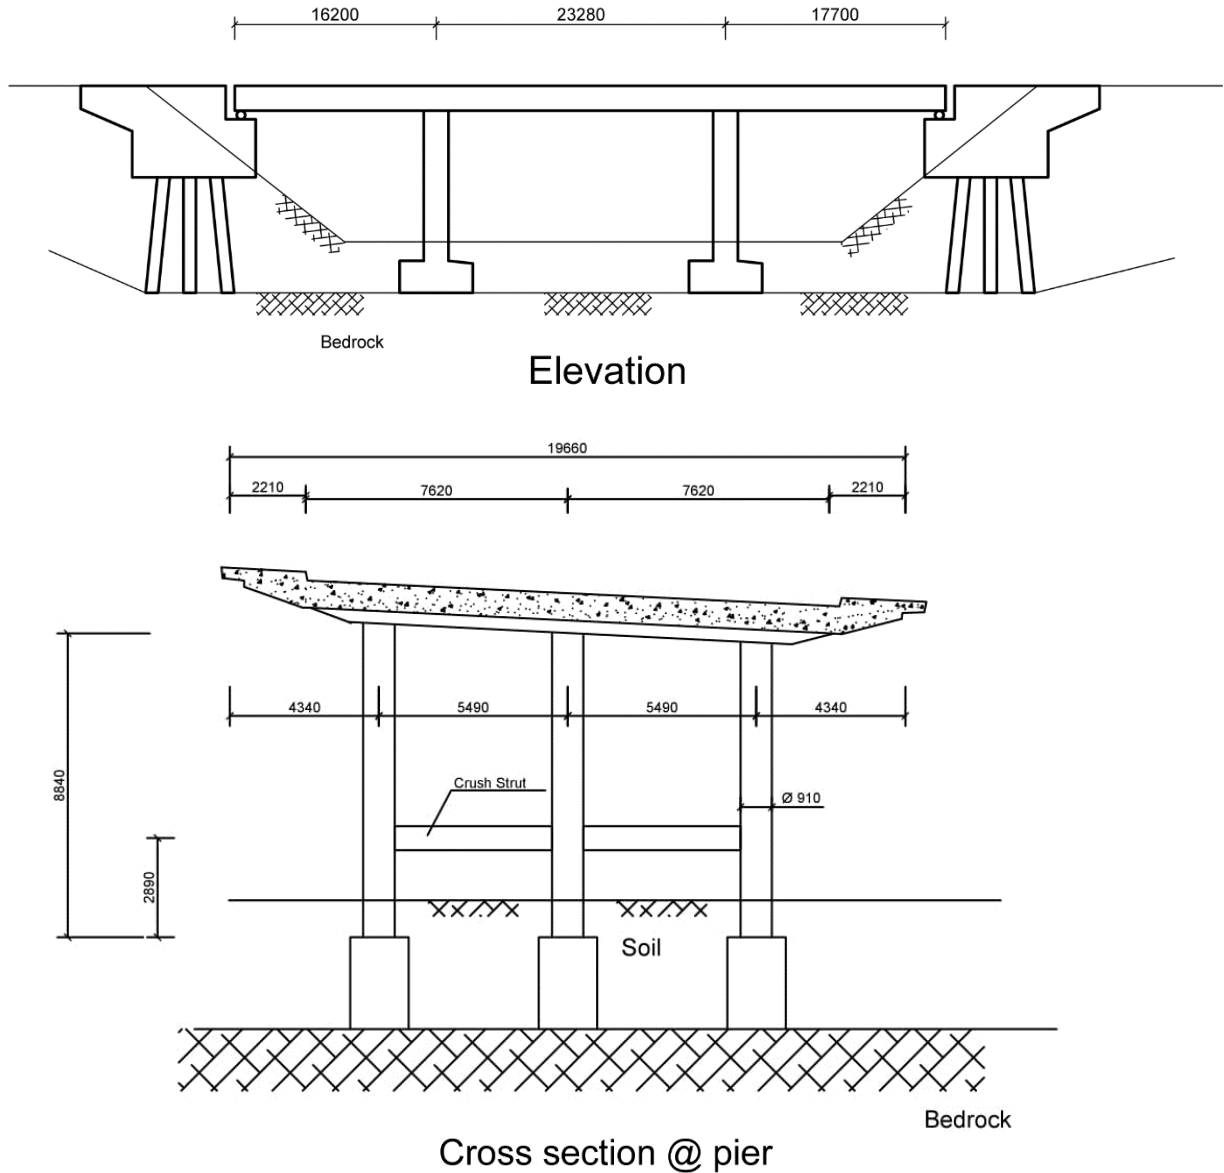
Geometric configuration of Bridge #6 adapted from Keivani (2003).
